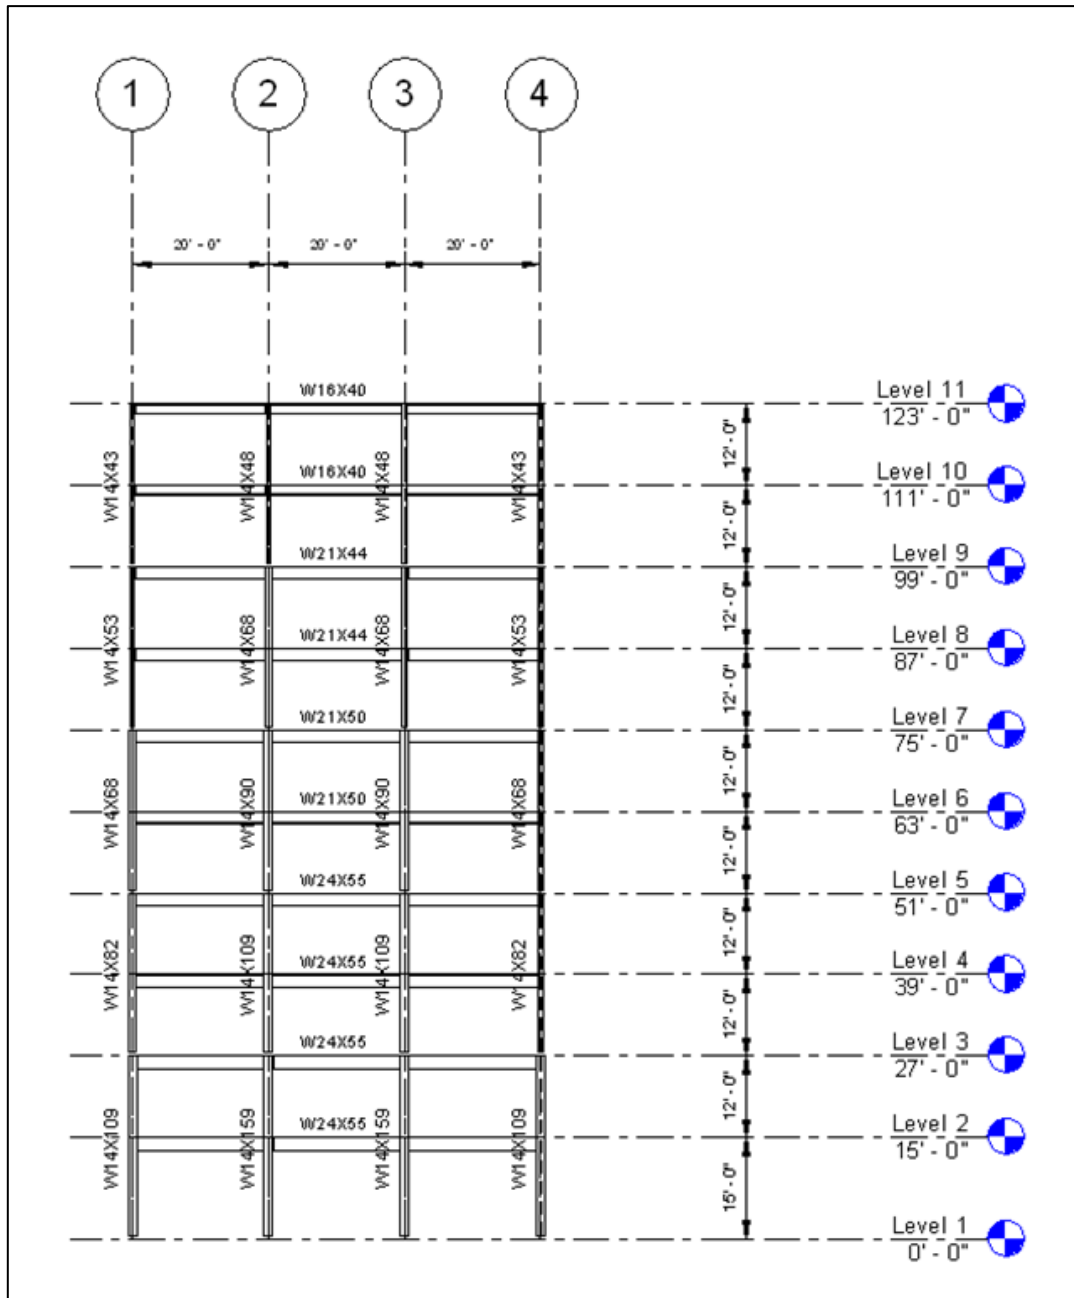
Moment Frame Elevation with Member Sizes and Dimensions Shown
